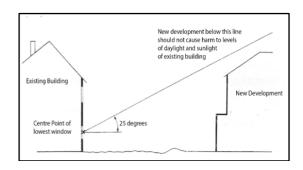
Section in plane perpendicular to the effected window wall from existing to proposed development showing acceptable application
